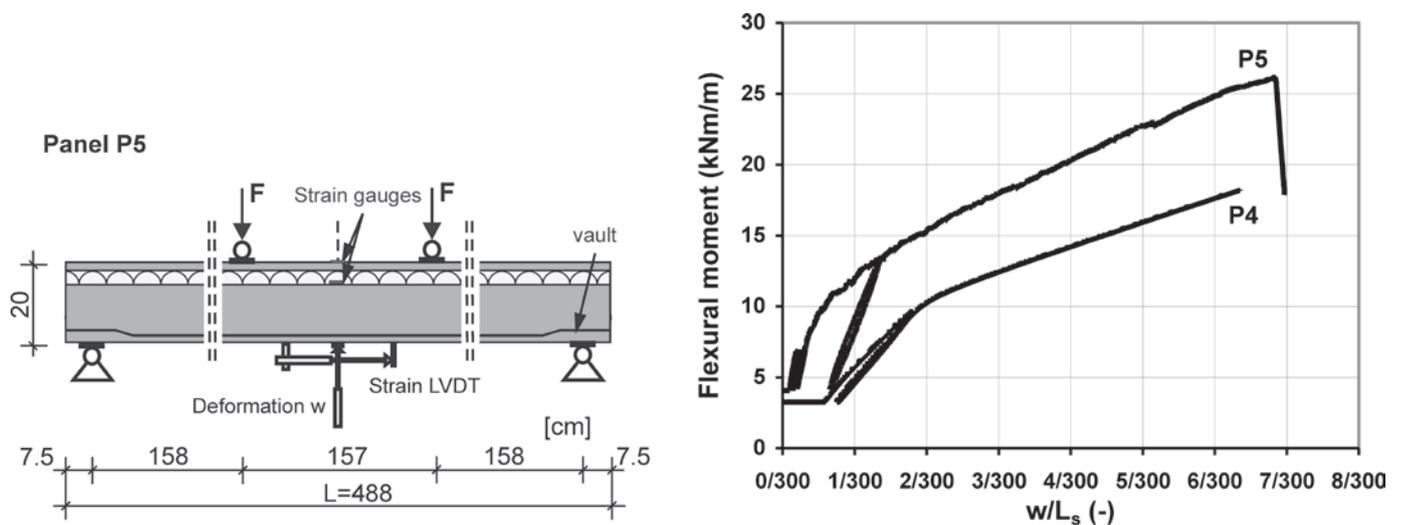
Set-up and load–deflection curve of four-point bending test on roof element
